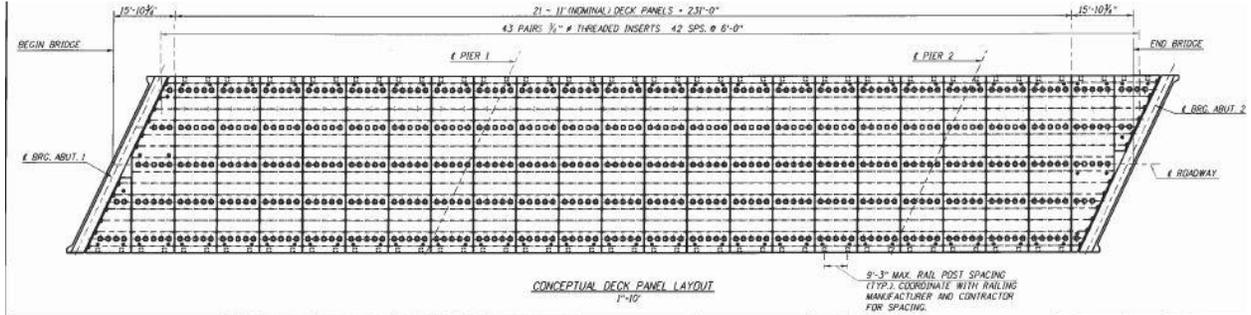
Diagram. Deck plan for main Salmon River Bridge.
